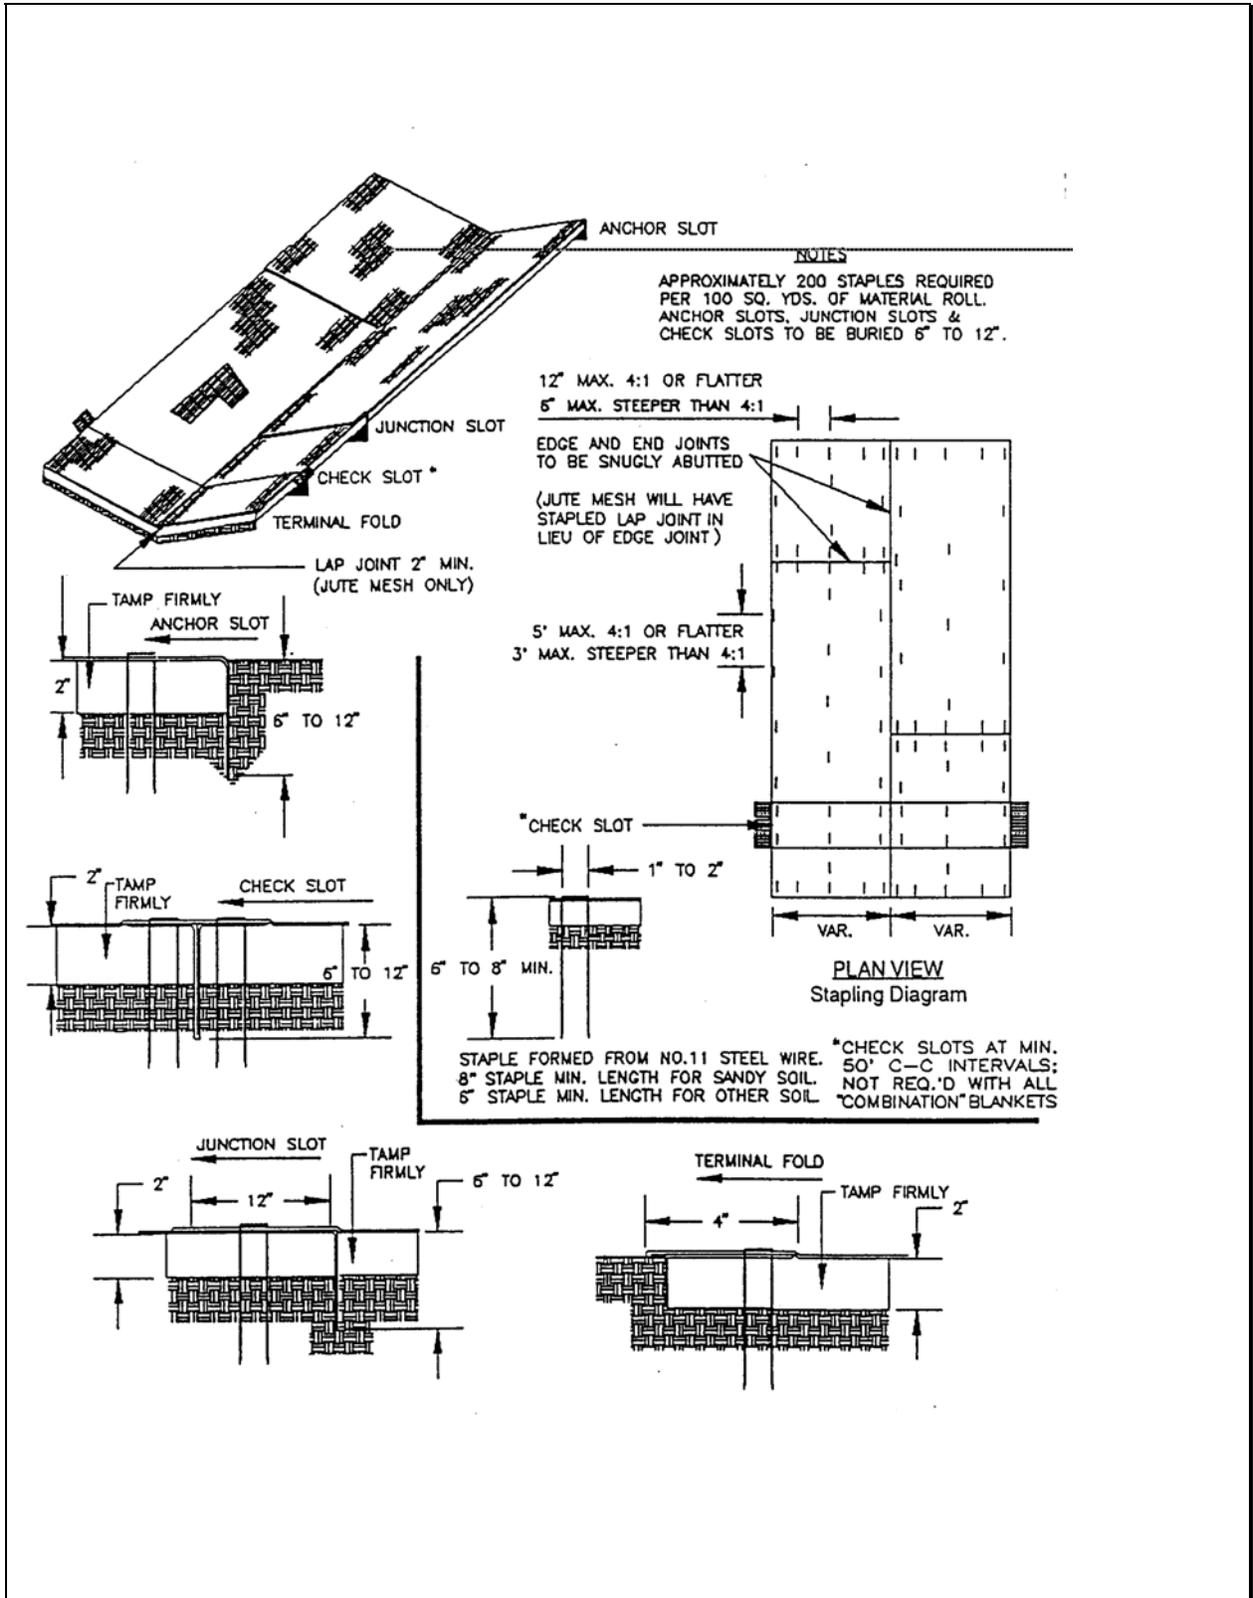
Typical Treatment 1 - Soil Stabilization Blanket Installation Guide
